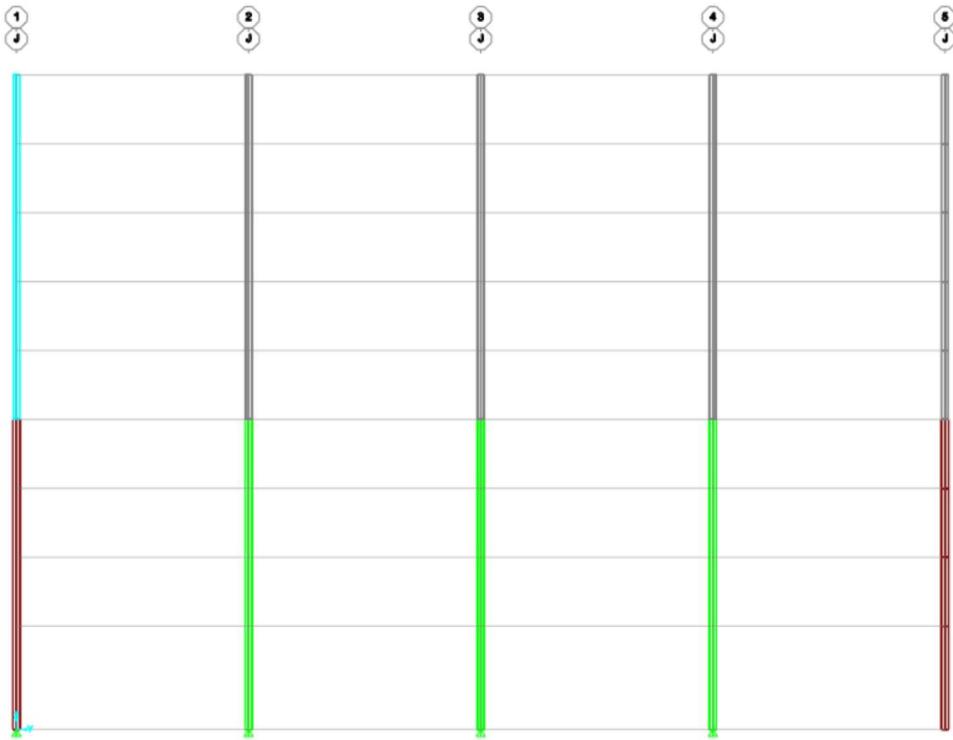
Column cross-section layout in the face J (SAP2000)
